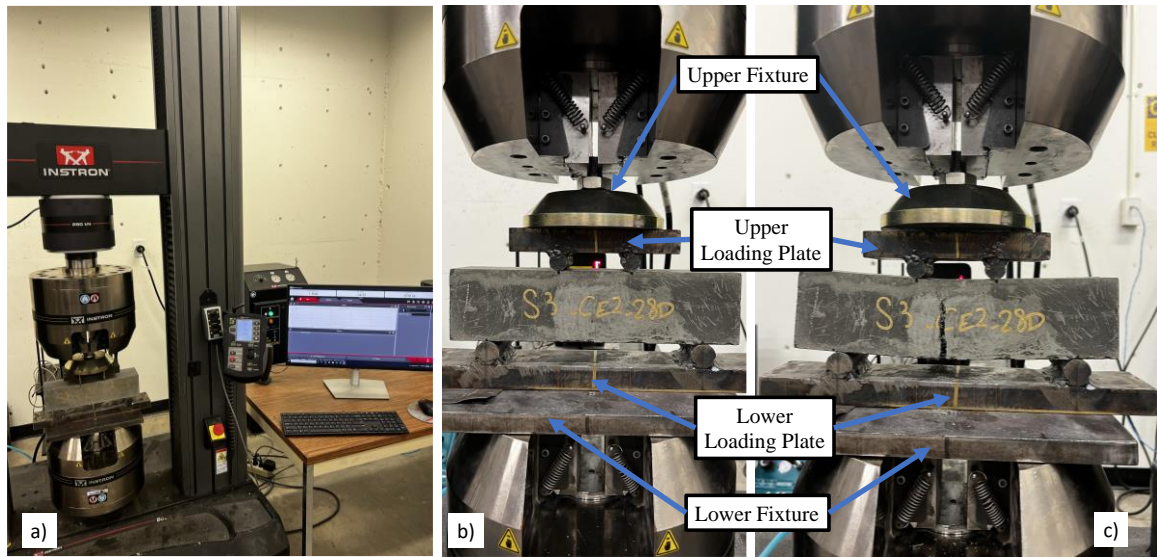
(a) Instron testing setup for 4-point bending; (b) A specimen is preloaded and ready for testing; (c) Failure of the specimen
